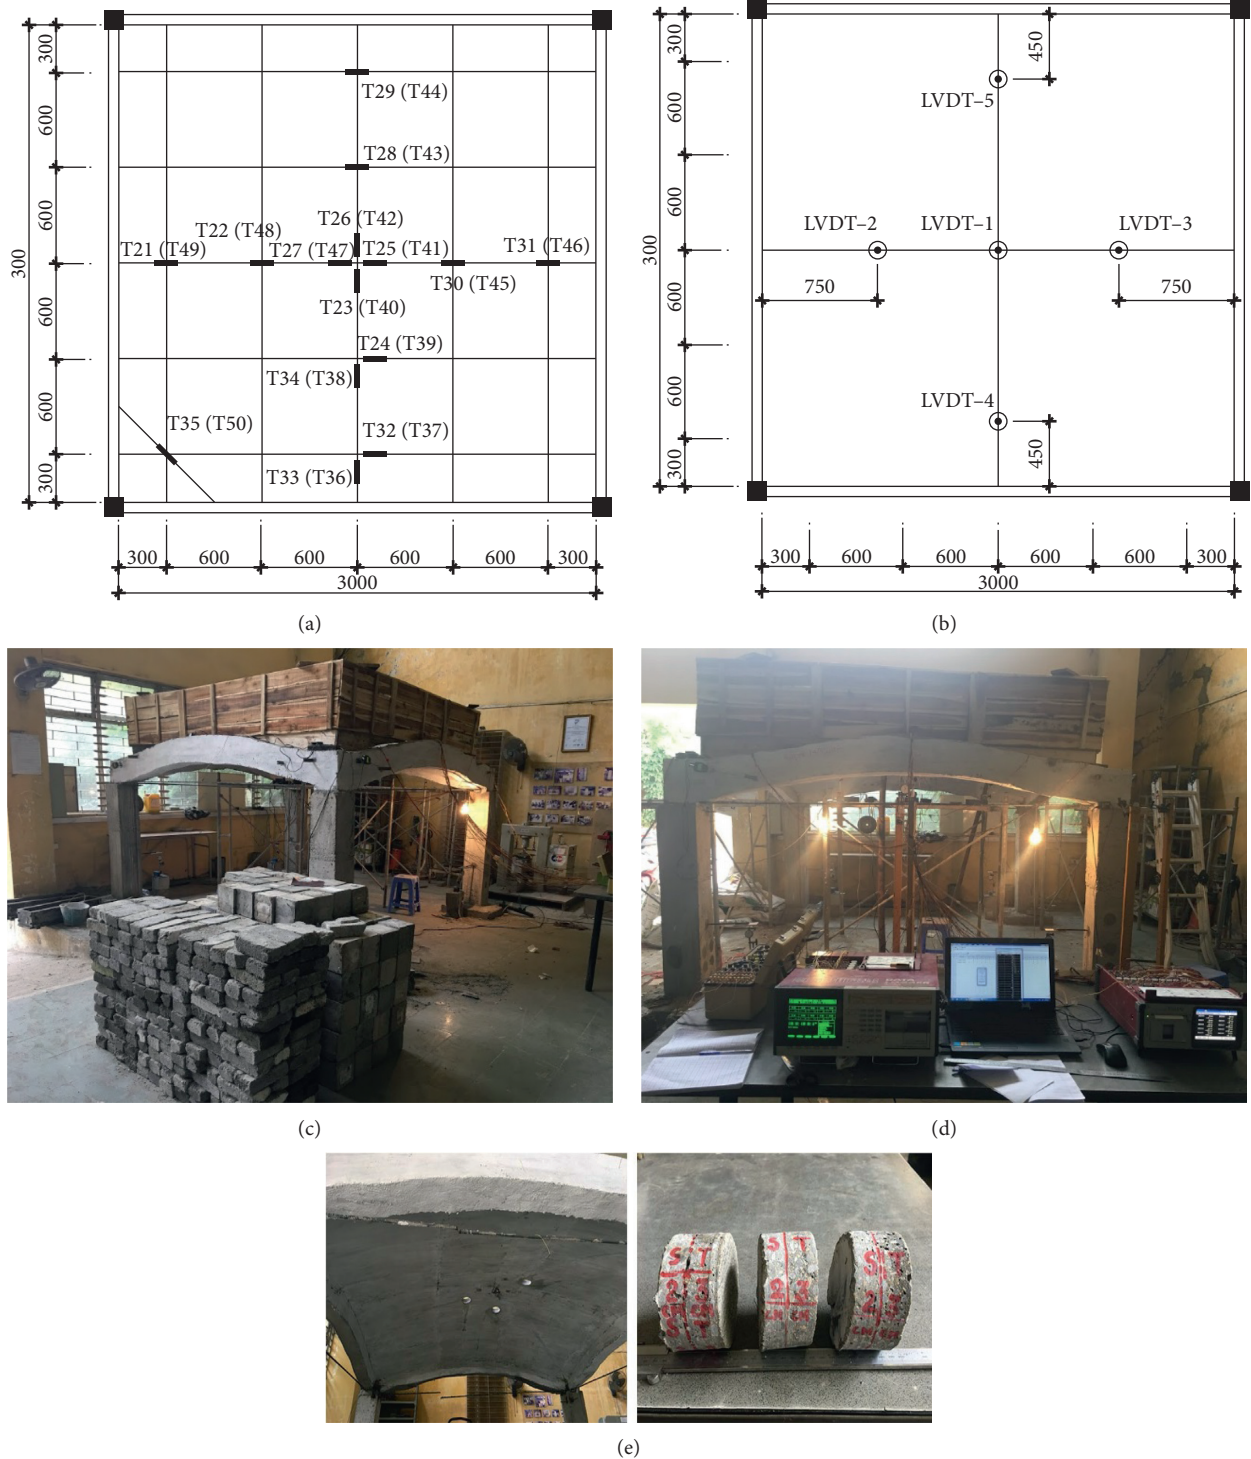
Installation of measuring equipment and loading on the shell. (a) Installation diagram of strain gauges (tensiometers). (b) Installation diagram of LVDTs. (c) Load the shell with small concrete blocks. (d) Connect the measuring equipment to the computers. (e) Check the thickness of the layers.
